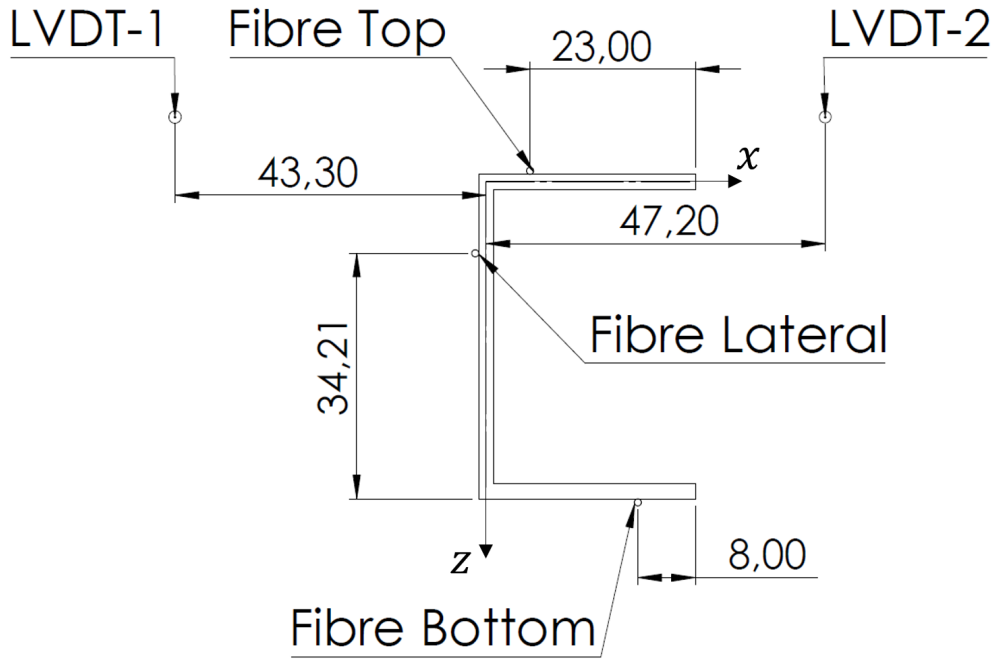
LVDTs and fibre optics location on the C-Beam's cross section.
